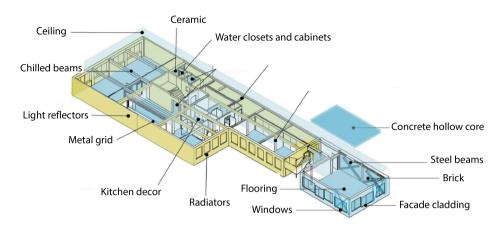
Re-used components on a typical floor. Illustration: MAD arkitekter
